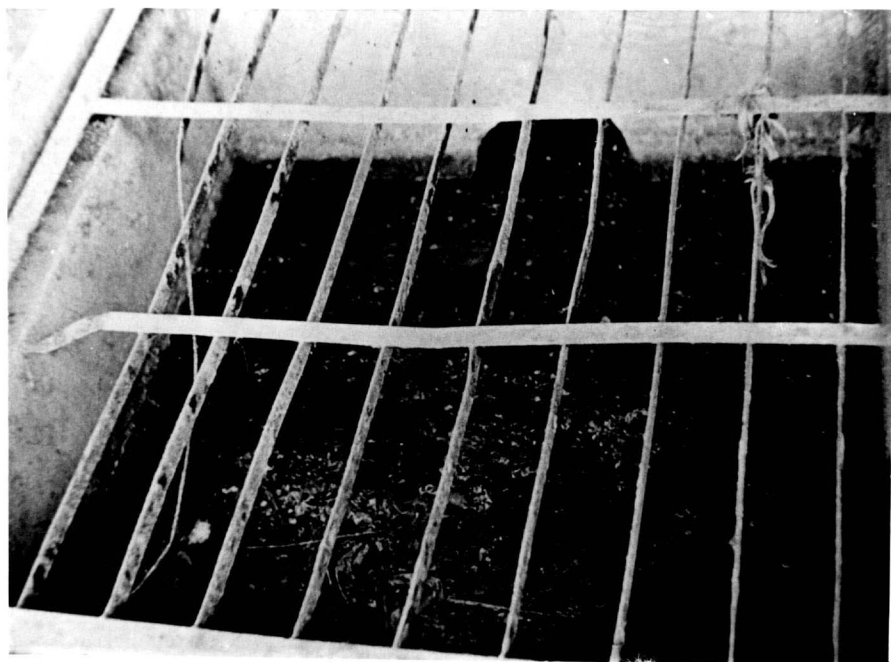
Wastewater Manhole of Abbatoir at Bangkhay.
